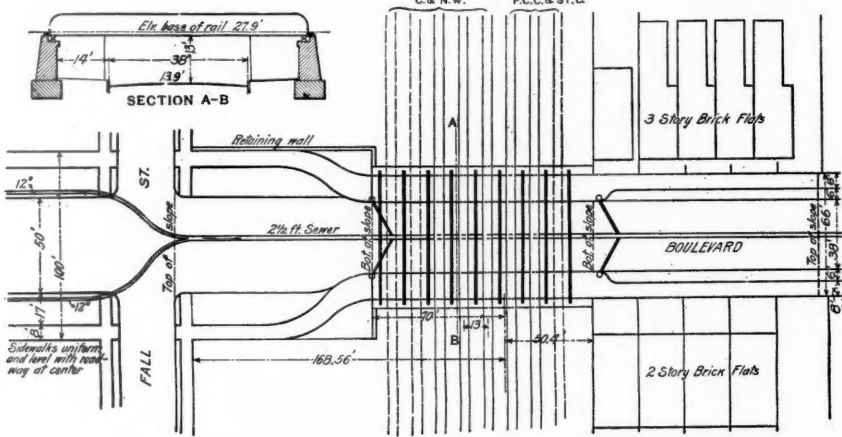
Street Plan of Subway—Washington Boulevard.
